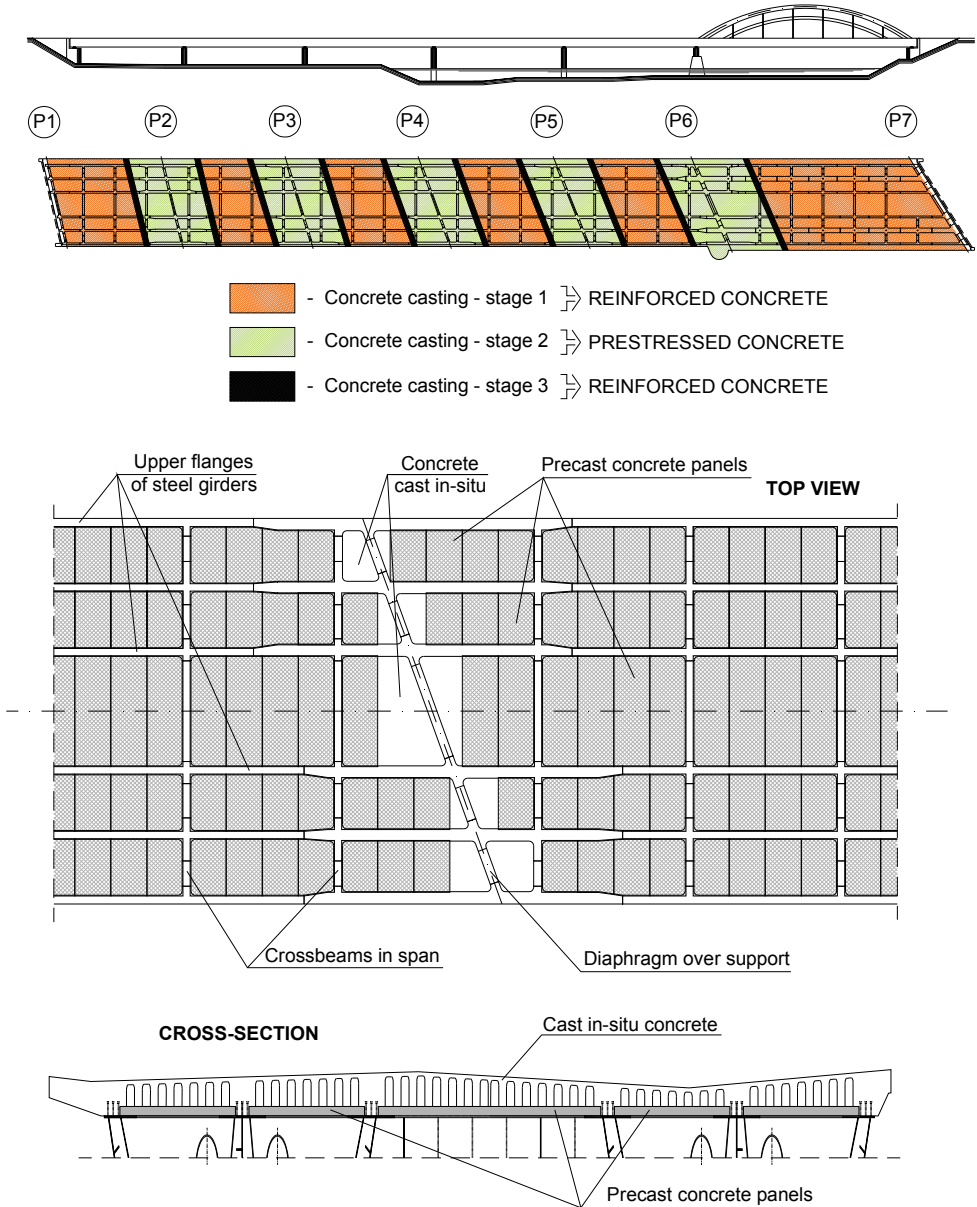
Scheme of deck slab casting and scheme of installation of prefabricated panels on the steel grid
